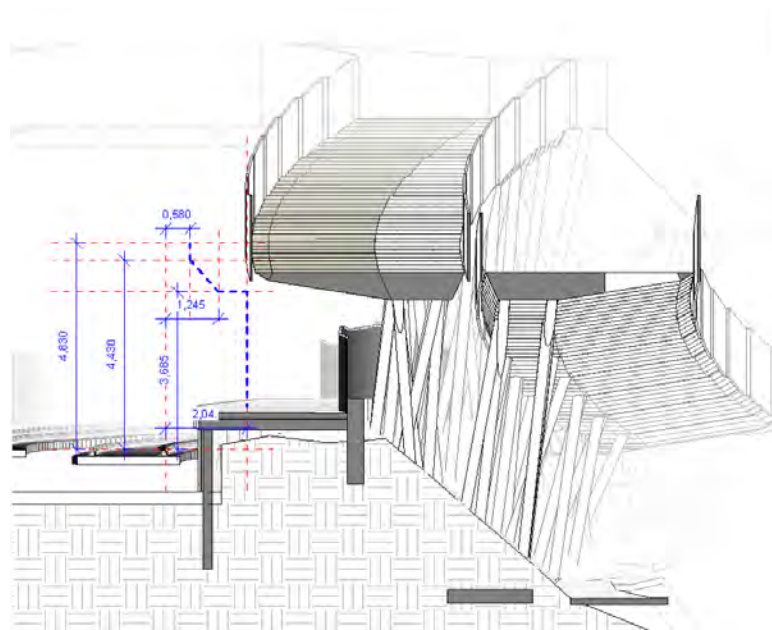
Section (A-A) at northern ramp showing structural gauges
